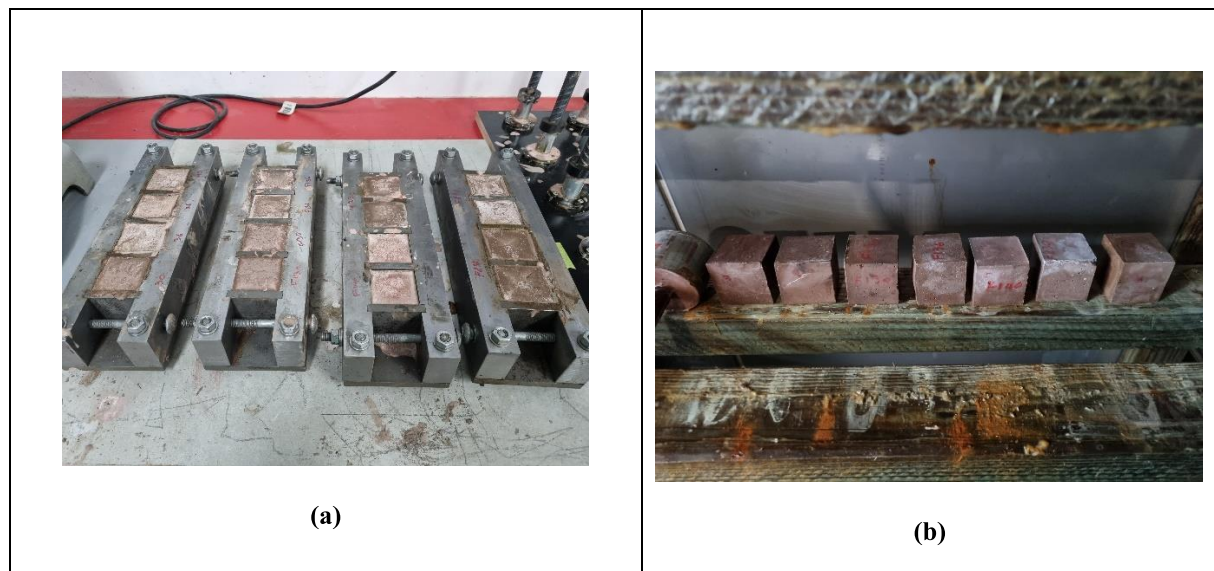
(a) a view of the moulds; (b) a view of curing the UCS samples
